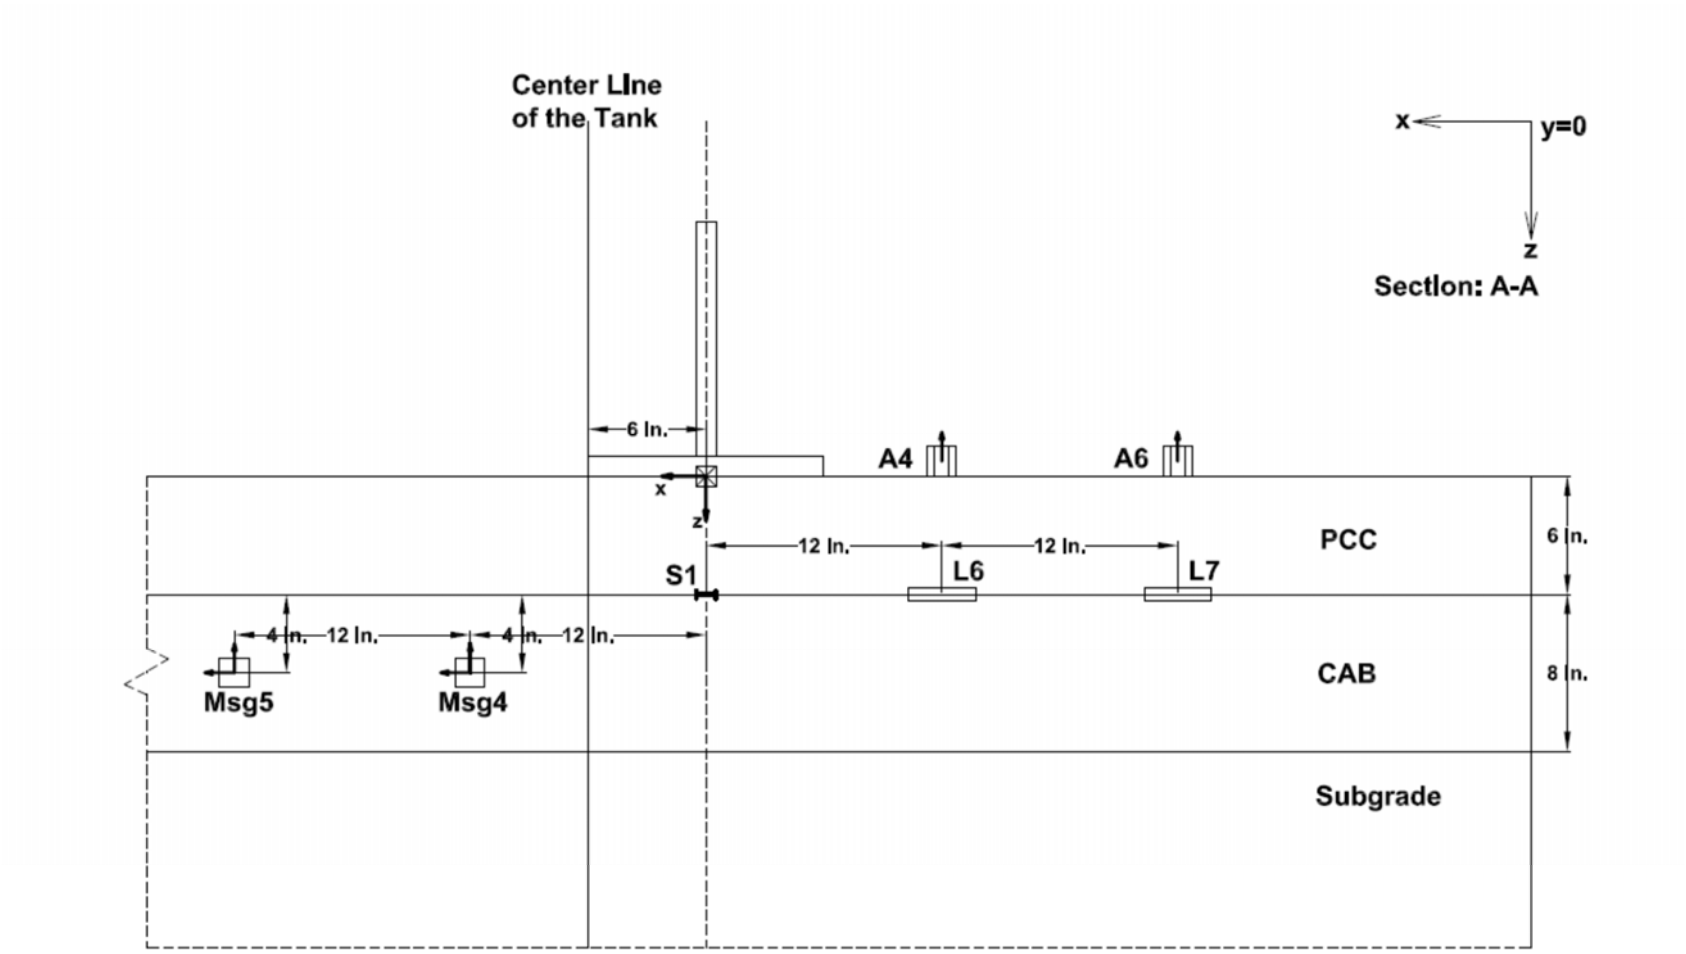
Instrumentation plan for experiment No. 7—Profile view, Y=0 inch
